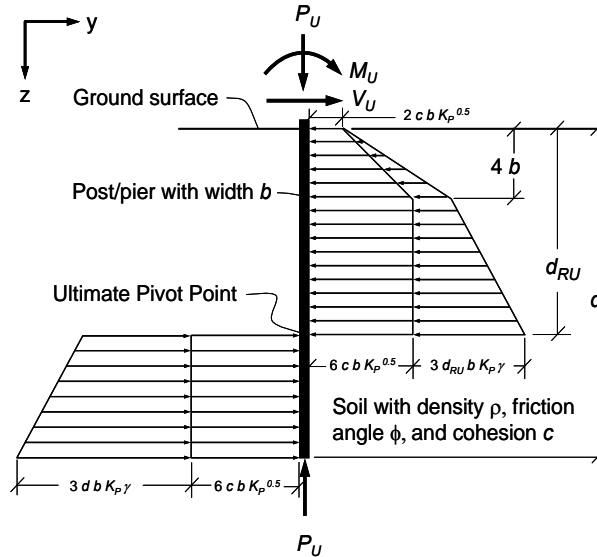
Forces acting on a non-constrained foundation of fixed width  $b$  in a homogenous soil at failure.
